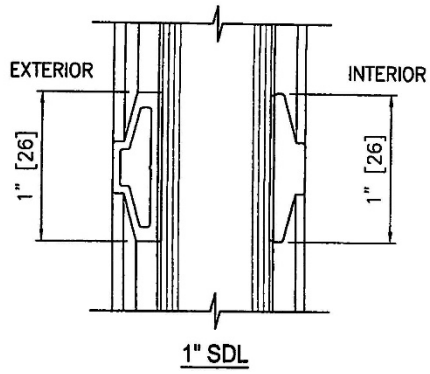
Diagram showing the proposed exterior grille for the existing windows installed in the building at 40 & 42 Askin Street (received as part of the Heritage Alteration Permit application).
